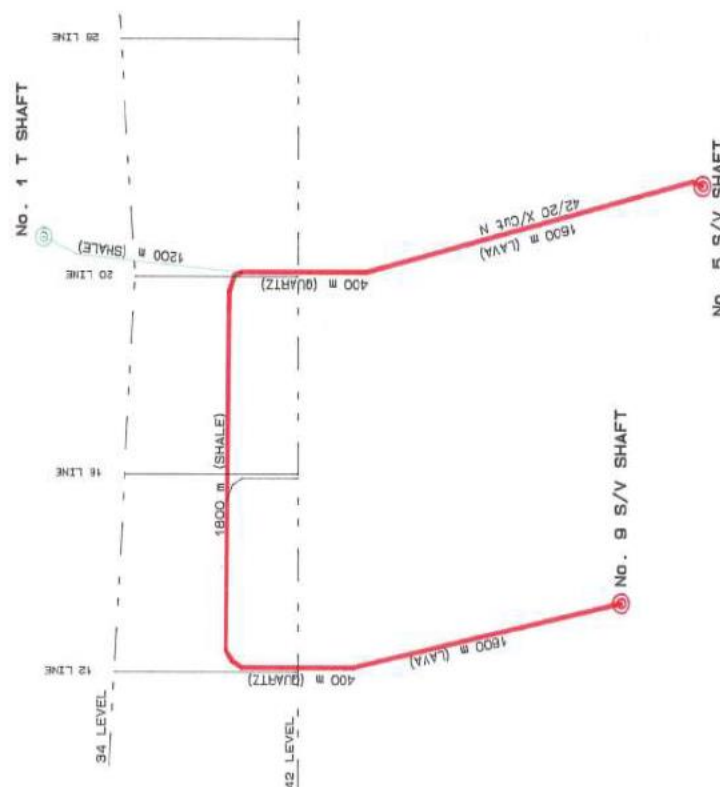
Image of a plan for a mechanical cut tunnel at East Driefontein (BBE Consulting internal report)
